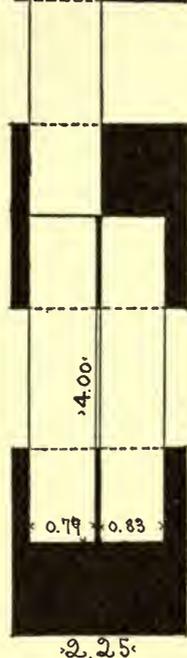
ARRANGEMENT OF EXISTING ARCHITRAVES.
